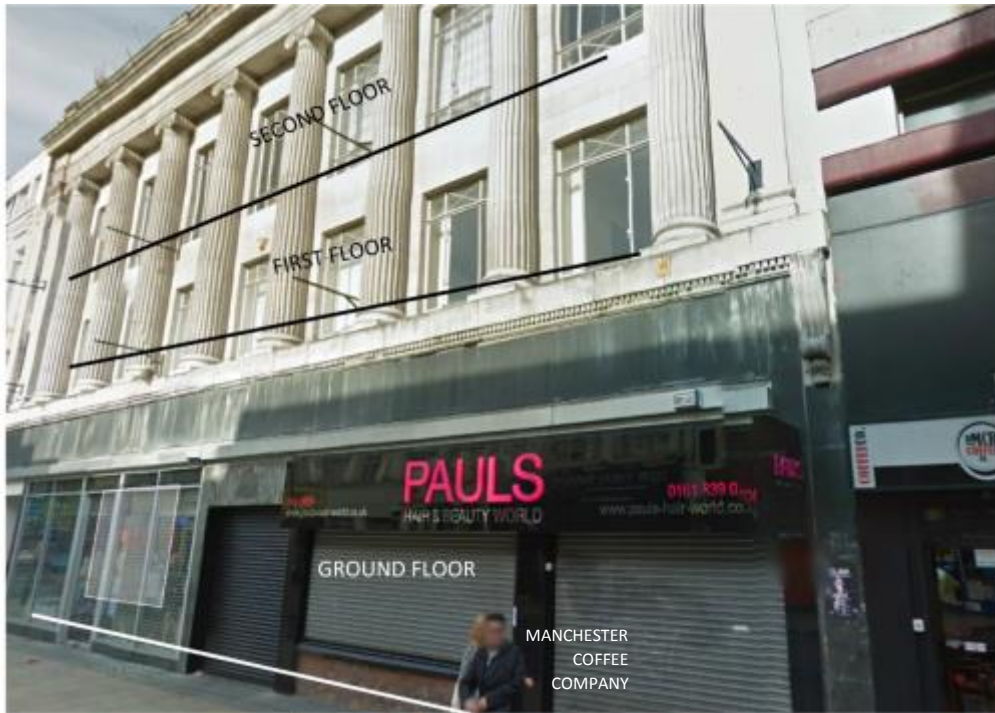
Front elevation of Pauls Hair & Beauty World from Oldham Street.
